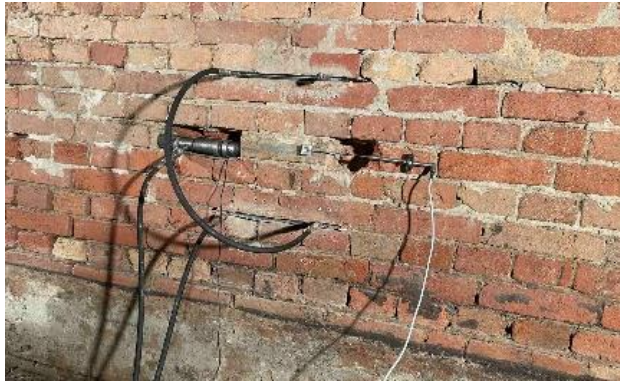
Test arrangement for determining the initial shear strength of masonry walls
